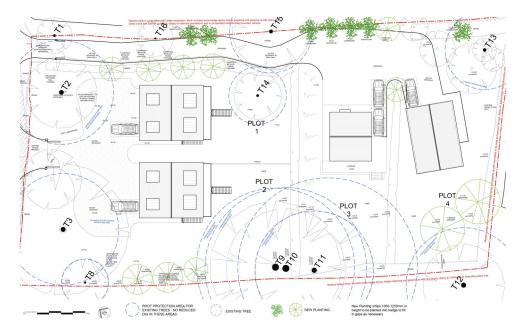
Proposed Site Plan (PP_SP_E) - Not to scale
